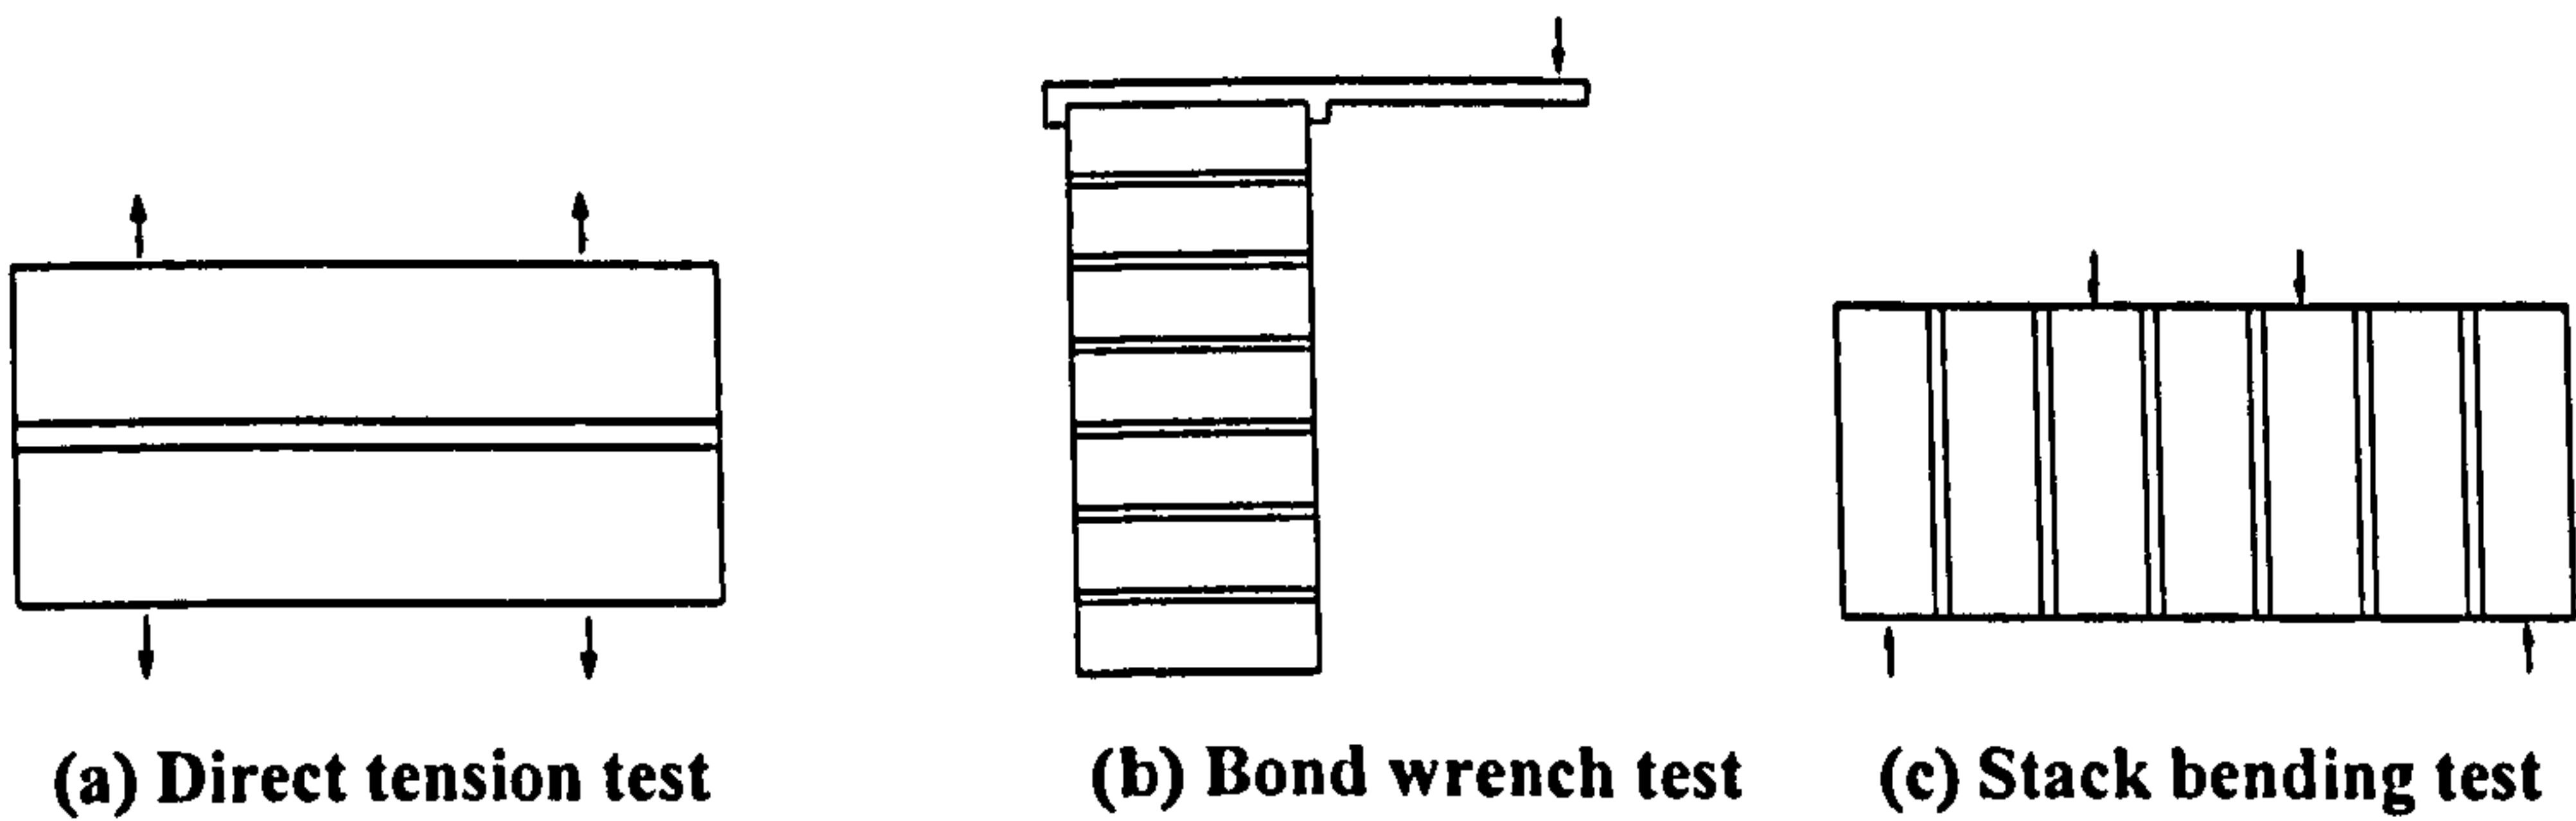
Tensile Test Methods For Brickwork Masonry
